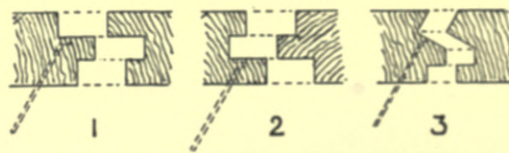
Sections of "Secret-nailed" Wood-blocks.
